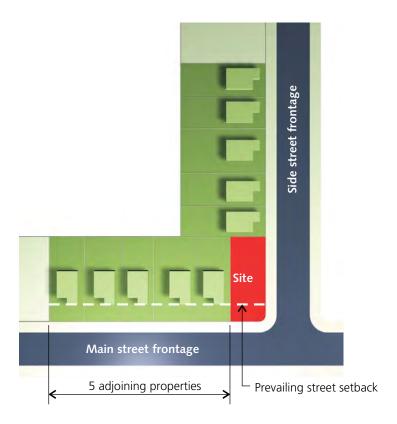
Calculation of the prevailing street setback on a corner development site
